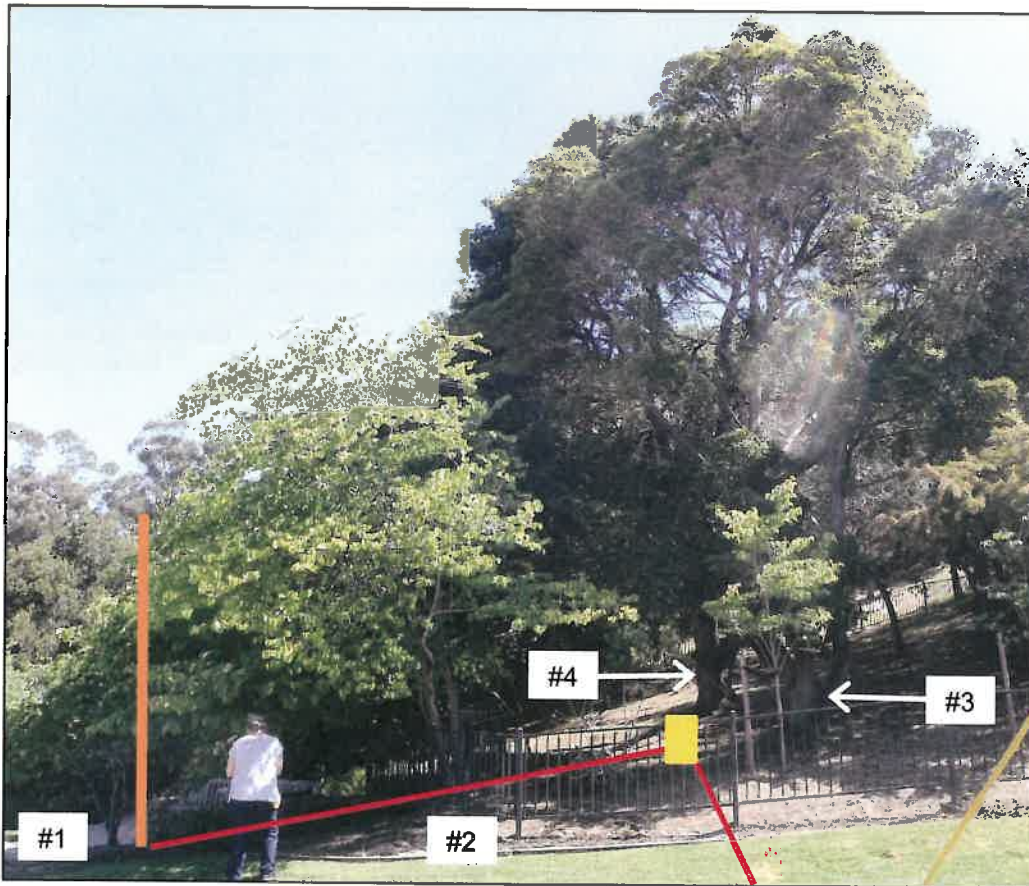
Looking east at trees #1-4 (L to R), with tree #4 in the background. The proposed trenching (red lines) from the street would connect to a disconnect box between trees #2 and 3 (yellow box) and continue north to the new pole location in the area of tree #1 (orange line).
